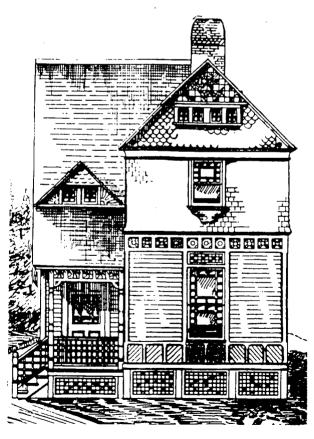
Robert Shoppell, Design 136 (Modern Low Cost Houses, 1884).
